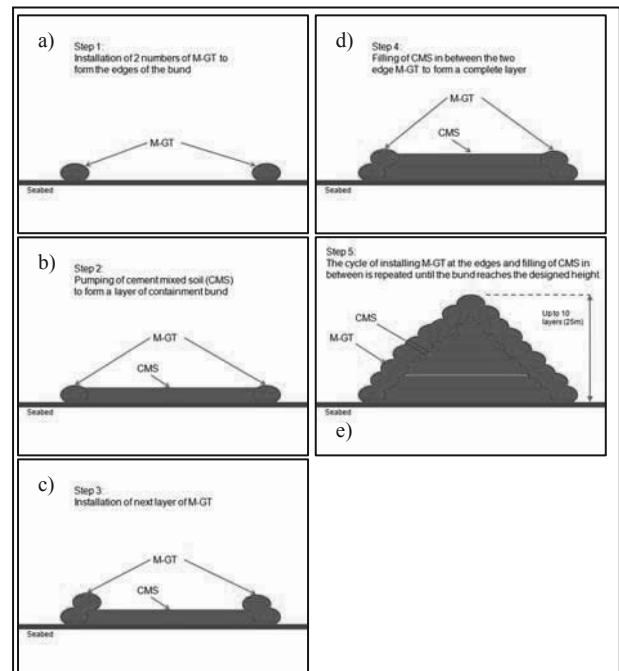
(a) to (e) Construction sequence of geotextile containment bund (cross-section view)
